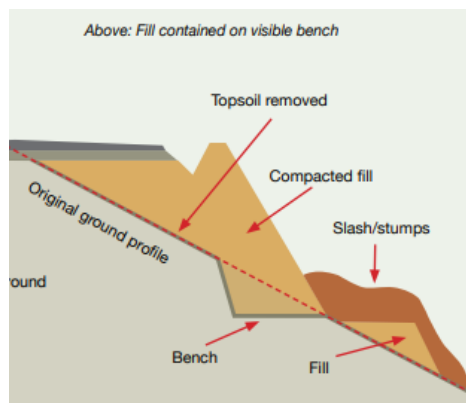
Cut and benched fill construction technique (FOA, 2020).
